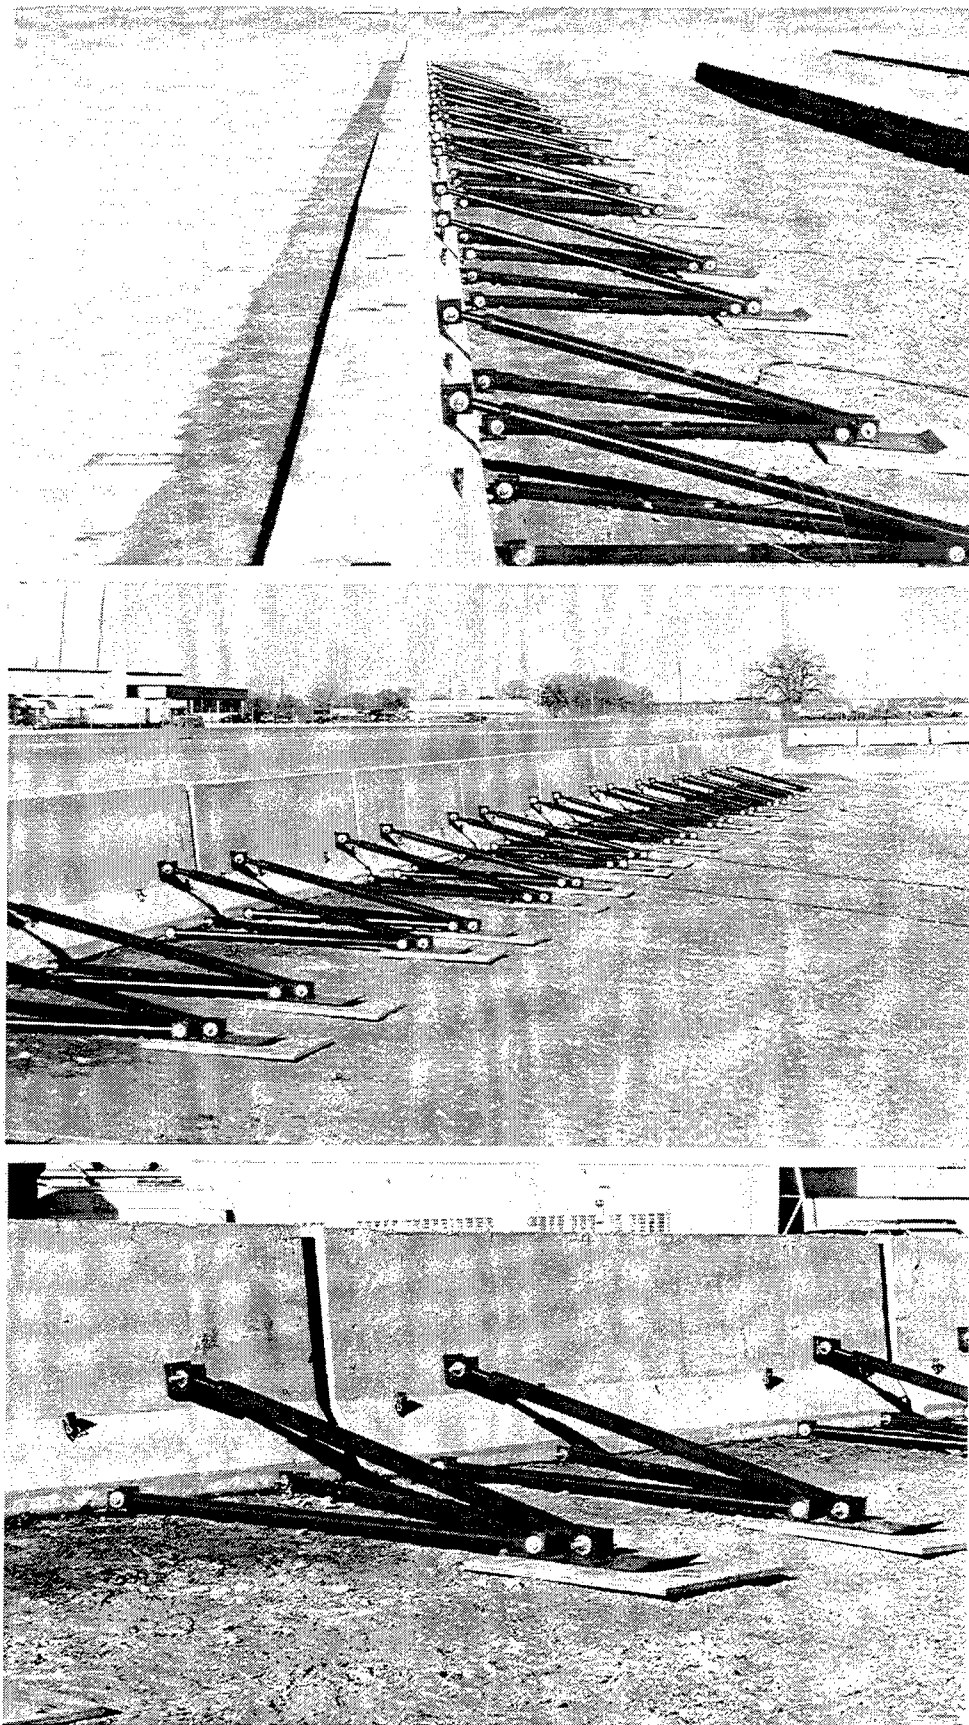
Portable Concrete Barrier System with Ski Design, Test KTS-1
